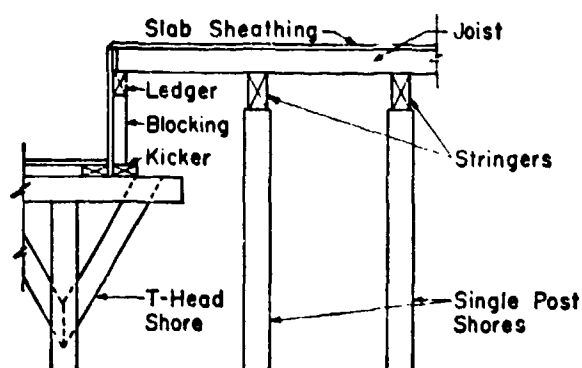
Slab sheathing supported on stringers and shores showing detail of connection to beam formwork (Courtesy of American Concrete Institute)
